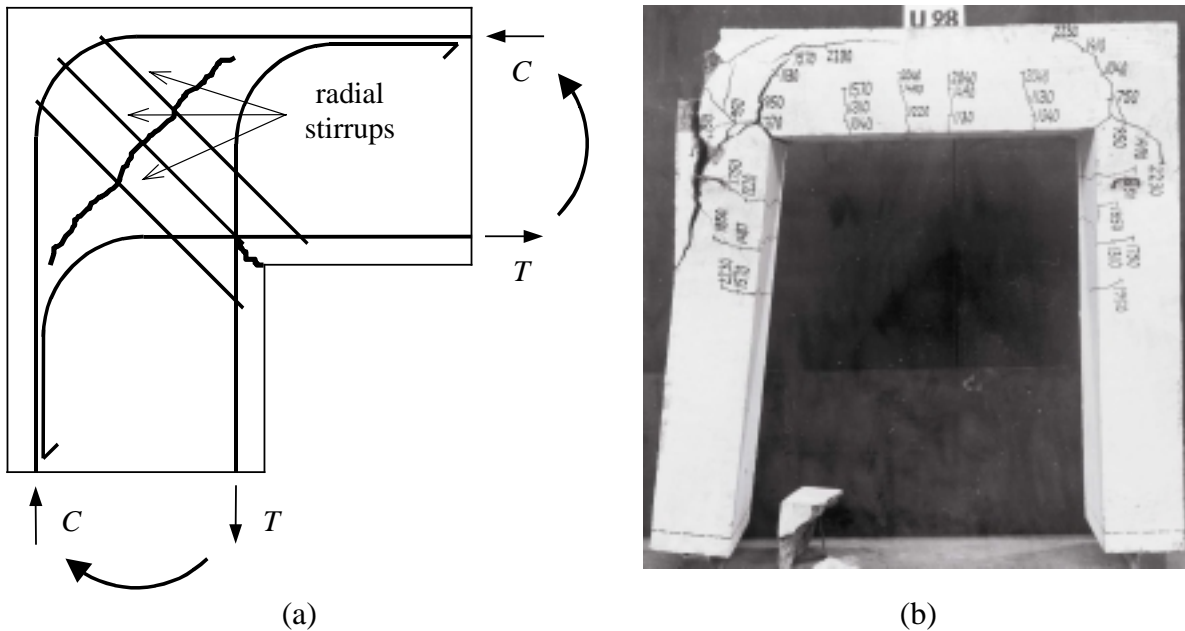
(a) Reinforcement detailing of *Type 2* where stirrups are positioned perpendicular to the expected secondary crack. (b) Crack pattern at failure when using this detailing. From Nilsson (1973).
